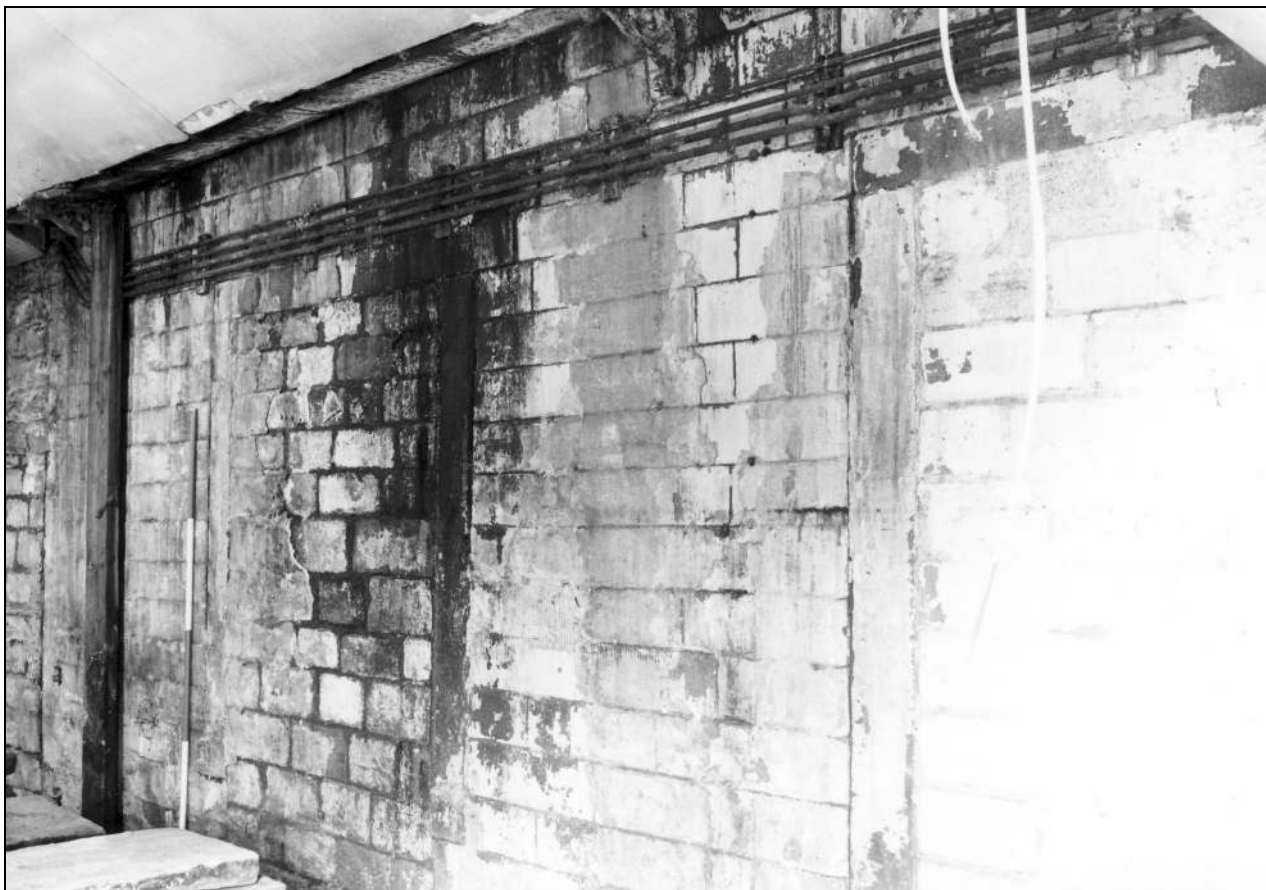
South side of warehouse, within later building, from the south (film 3, frame 1)
